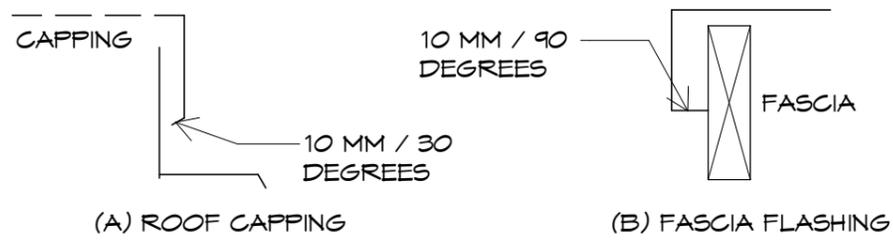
PARAPET FLASHING ACCEPTABLE FLASHING DETAILS
